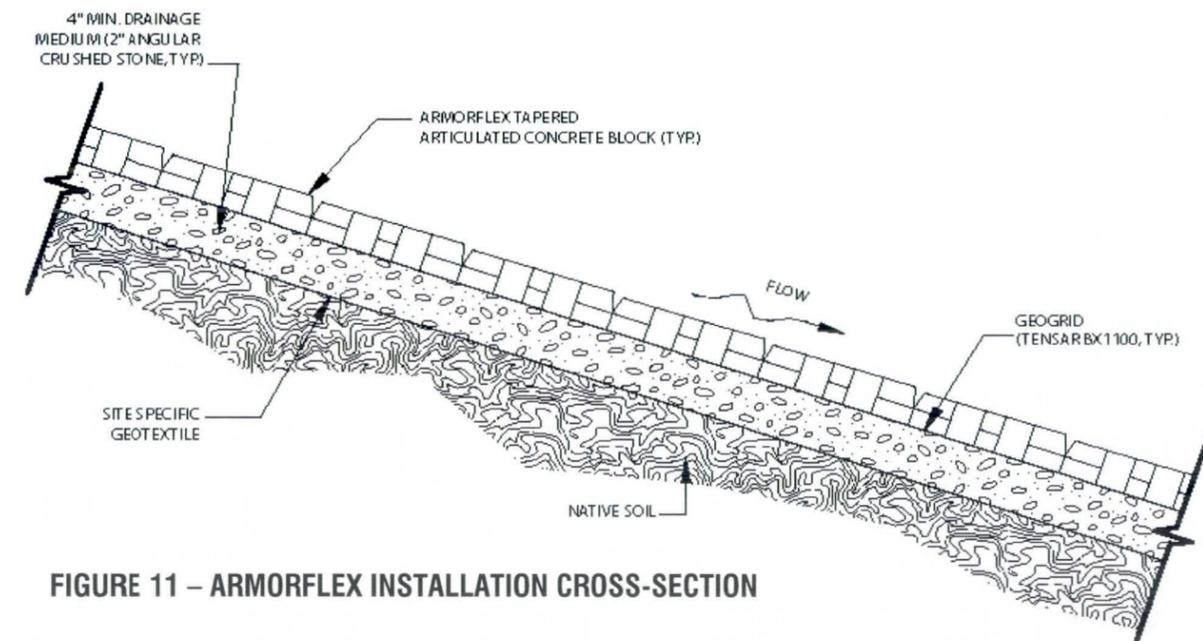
ARMORFLEX INSTALLATION CROSS-SECTION
